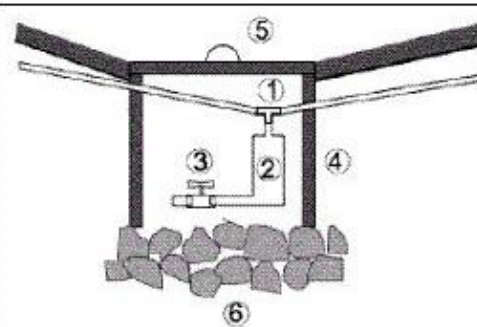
Manual water trap: (1) T-joint, (2) buffer storage for condensated water, (3) manual tap, (4) casing, (5) concrete lid, (6) drainage
